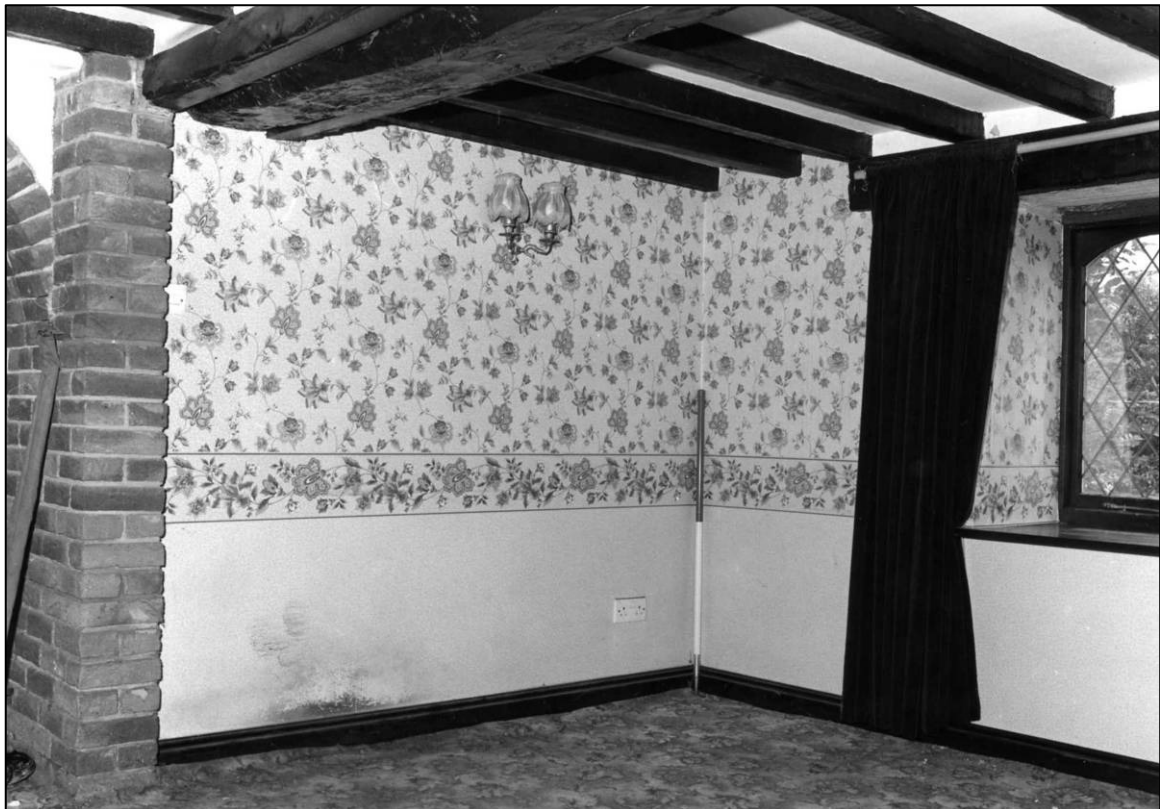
Barn Cottage range, S part, N ground floor room (Room 8), looking NE (photo 6/11).
